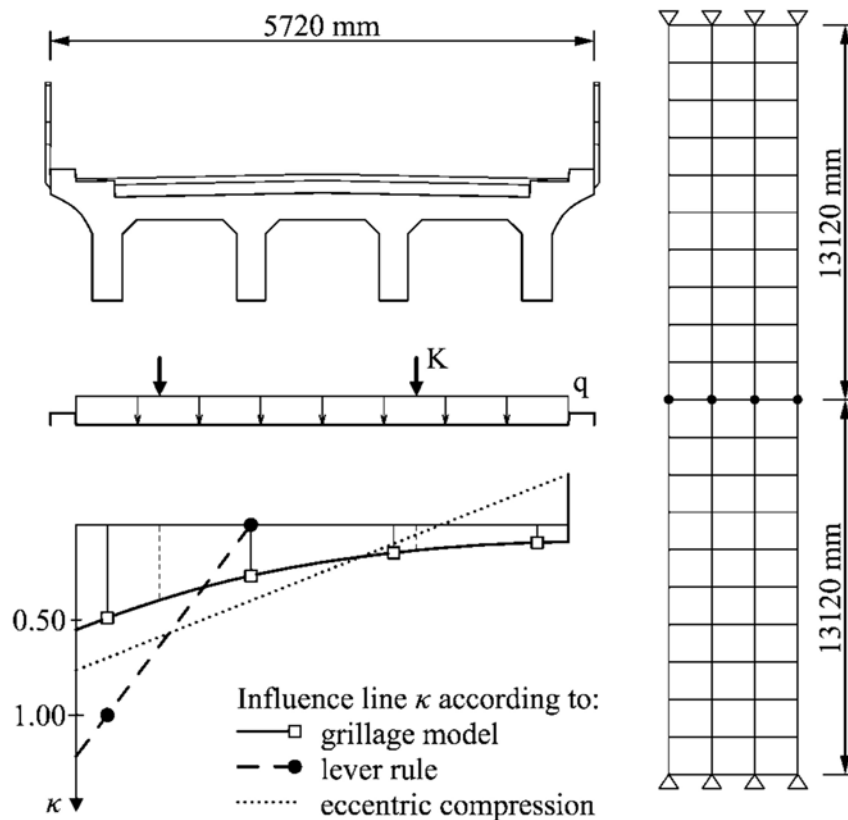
Grillage mesh, cross section and load distribution for external girder in four-girder concrete bridge
